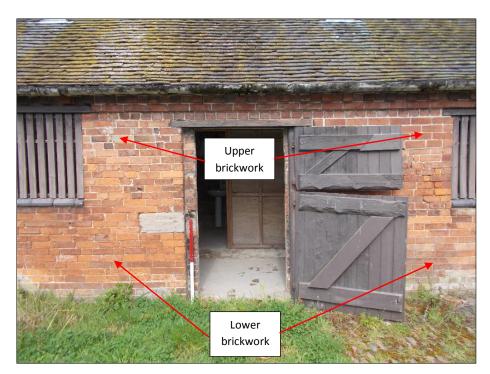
The use of differing brickwork in the stockyard elevation of the cattle stall range, looking north-west. 1m scale rod.
